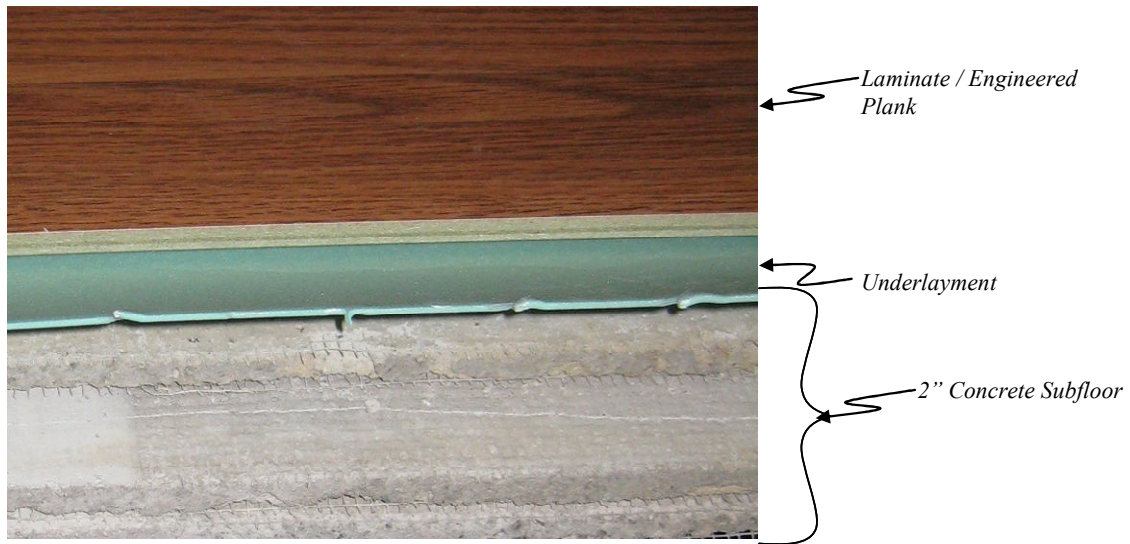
Experimental setup for floating laminate/engineered flooring installed with underlayment on concrete.
